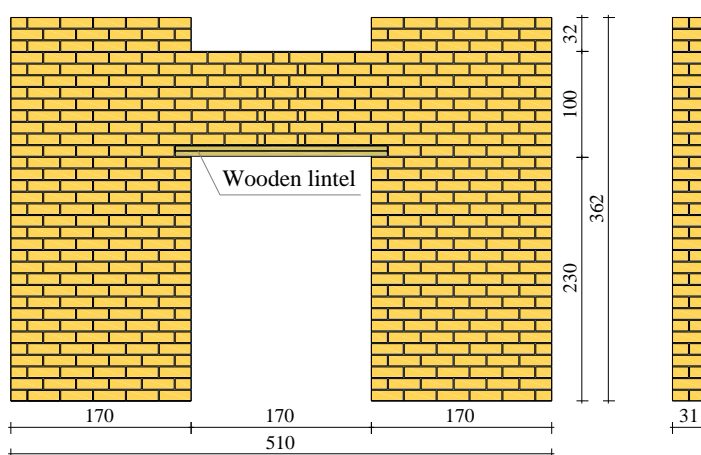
Geometry of as-built specimen (dimensions in cm)
